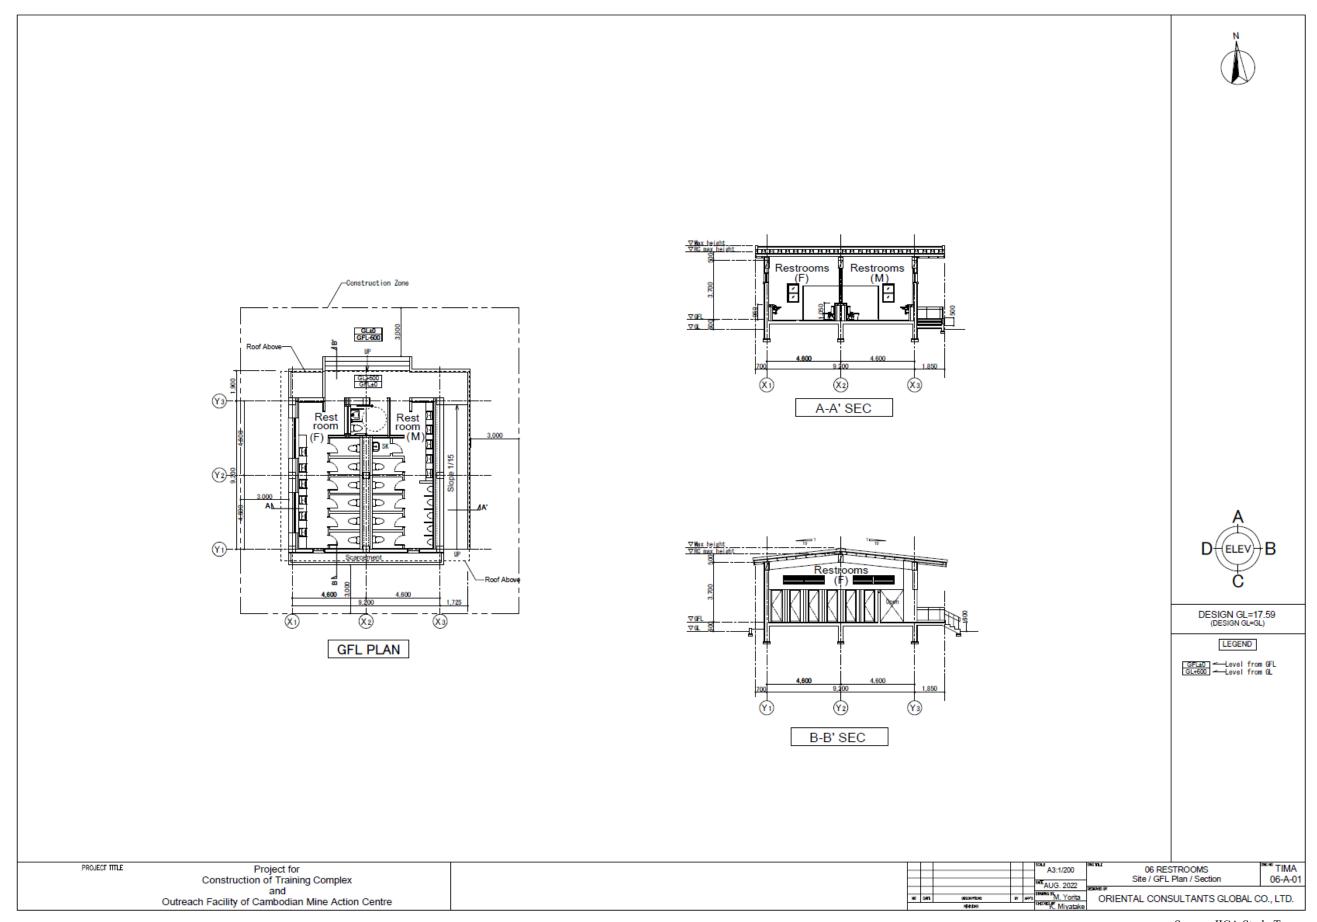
Floor Plan and Section of TIMA Restrooms for Classrooms
